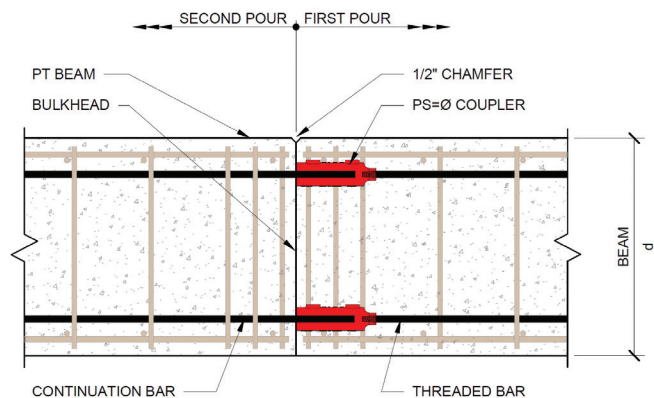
PS=Ø beam-to-beam restraint relief joint
